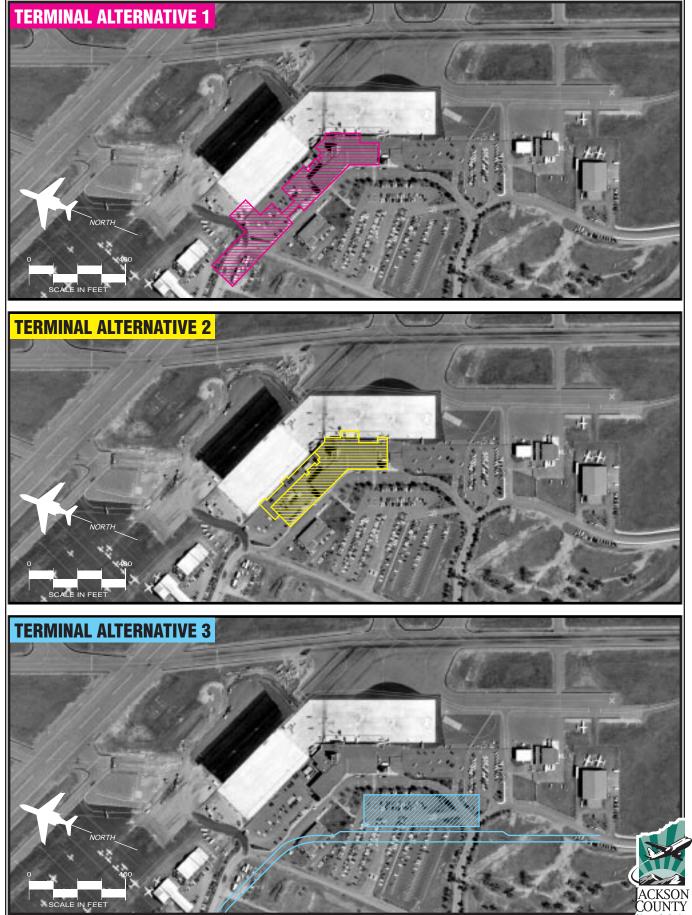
C TERMINAL BUILDING LOCATIONAL ALTERNATIVES - 1993 PLAN existing administration building be razed, and the termind entry road and curb be relocated. It would provide a linear configuration for the terminal building which could be easily expanded in the future, and would replace an aging structure initially constructed in the early 1950s. The 20year development cost was \$13.5 million.
